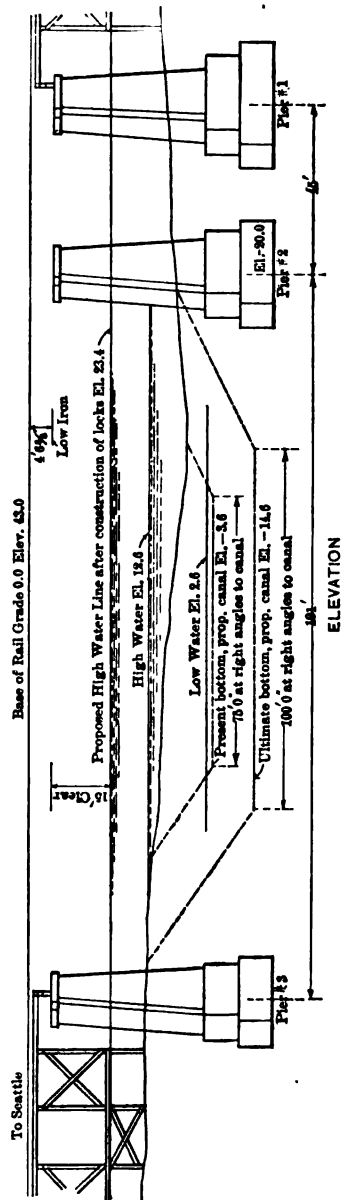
SALMON BAY PIERS, NORTHERN PACIFIC RY.
